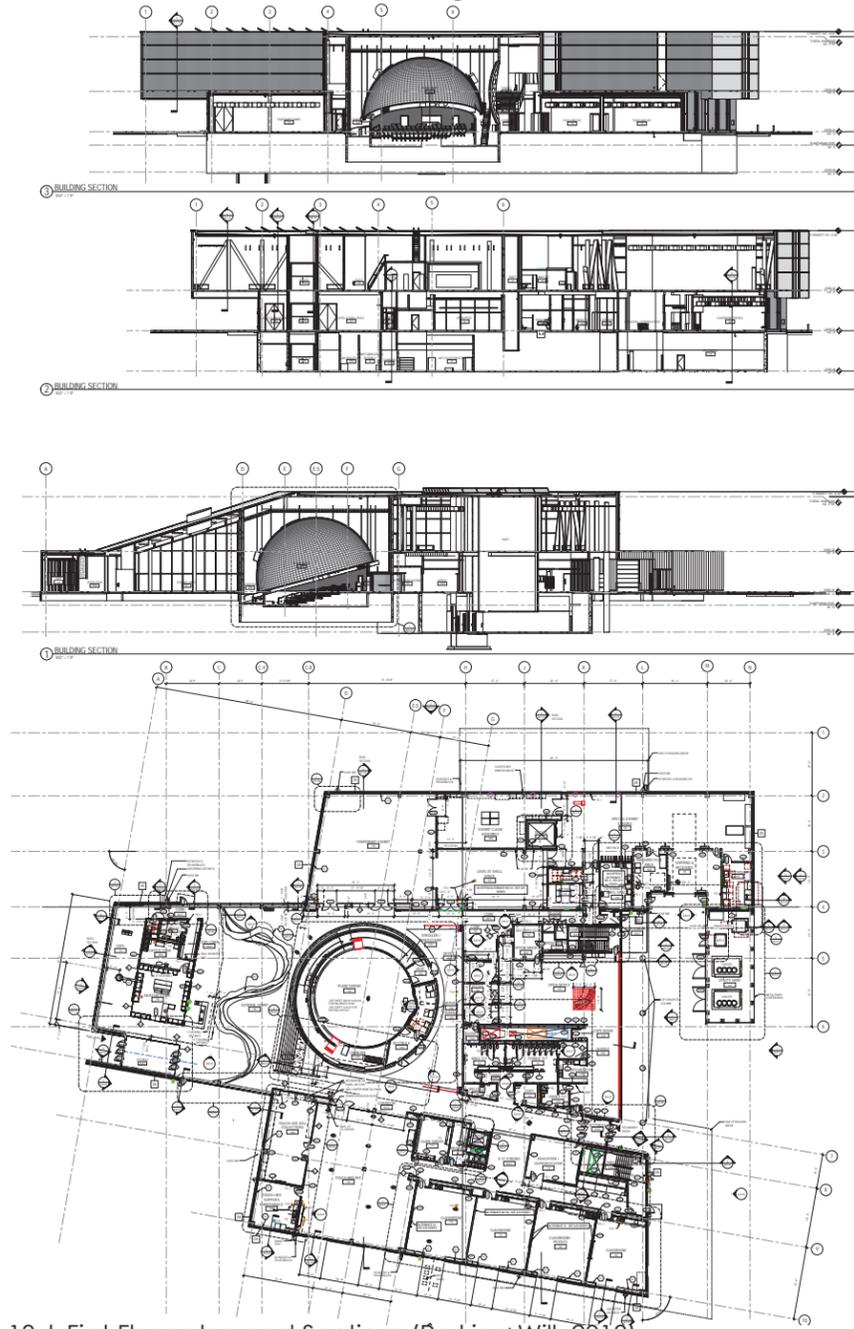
| First Floor plan and Sections (Perkins+Will, 2018)
